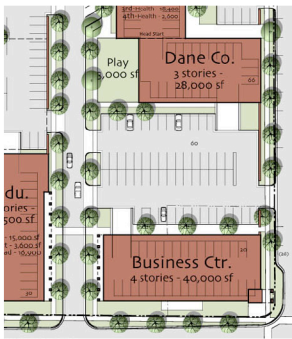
Building placement to support street edges and orientation for daylighting.
